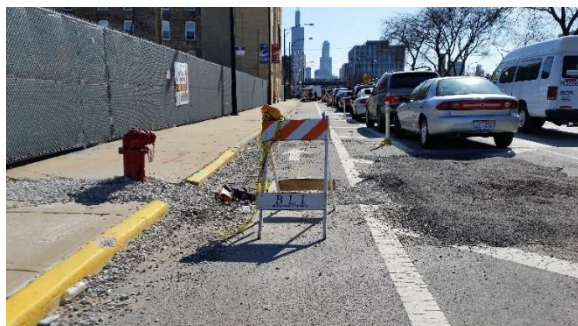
Trench work completed for a fire hydrant. The bicycle lane pavement was left open with aggregate and the adjacent parking lane was patched with uneven asphalt.
